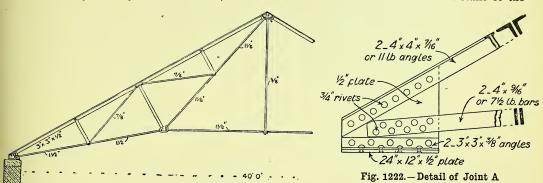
Fink Roof Truss for 40-ft. Span.
